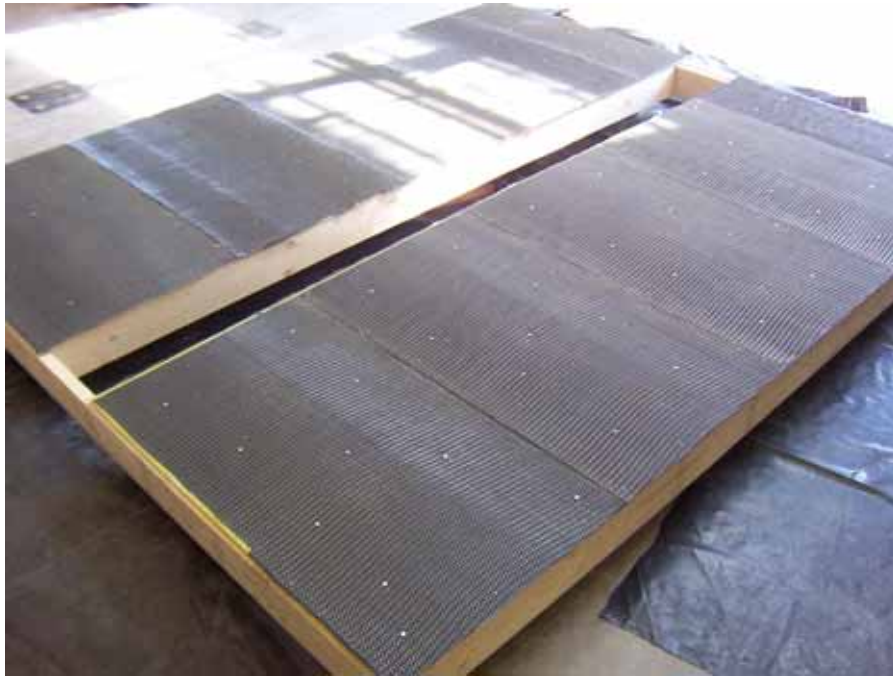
Stucco Lath Applied to Test Frame with Gypsum Specimen (Upper Left) and Dinsglass Specimen (Lower Right)
